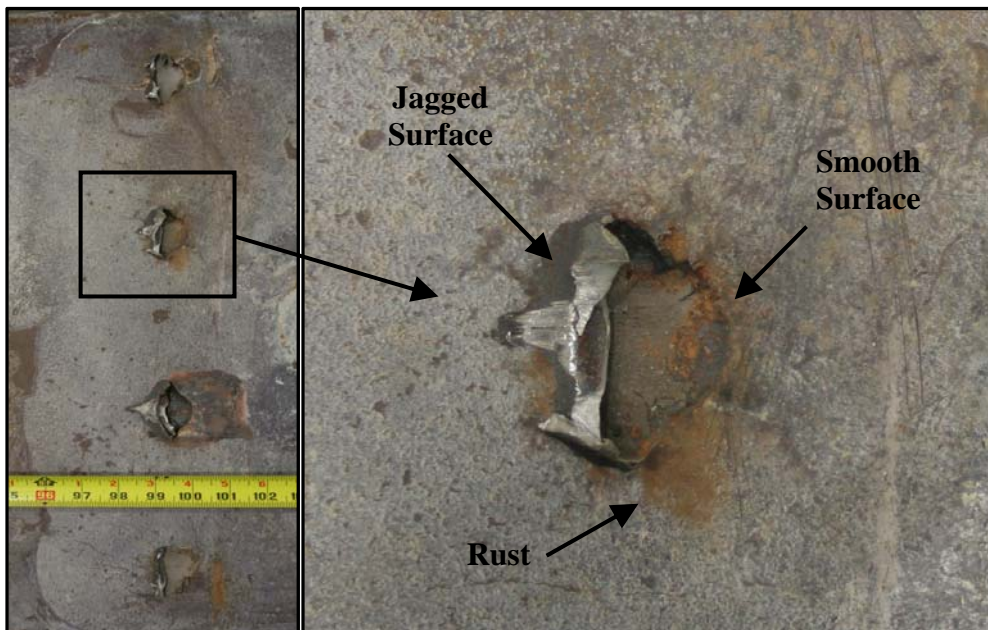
Illustration. Failure surface of typical divot in steel plate.
